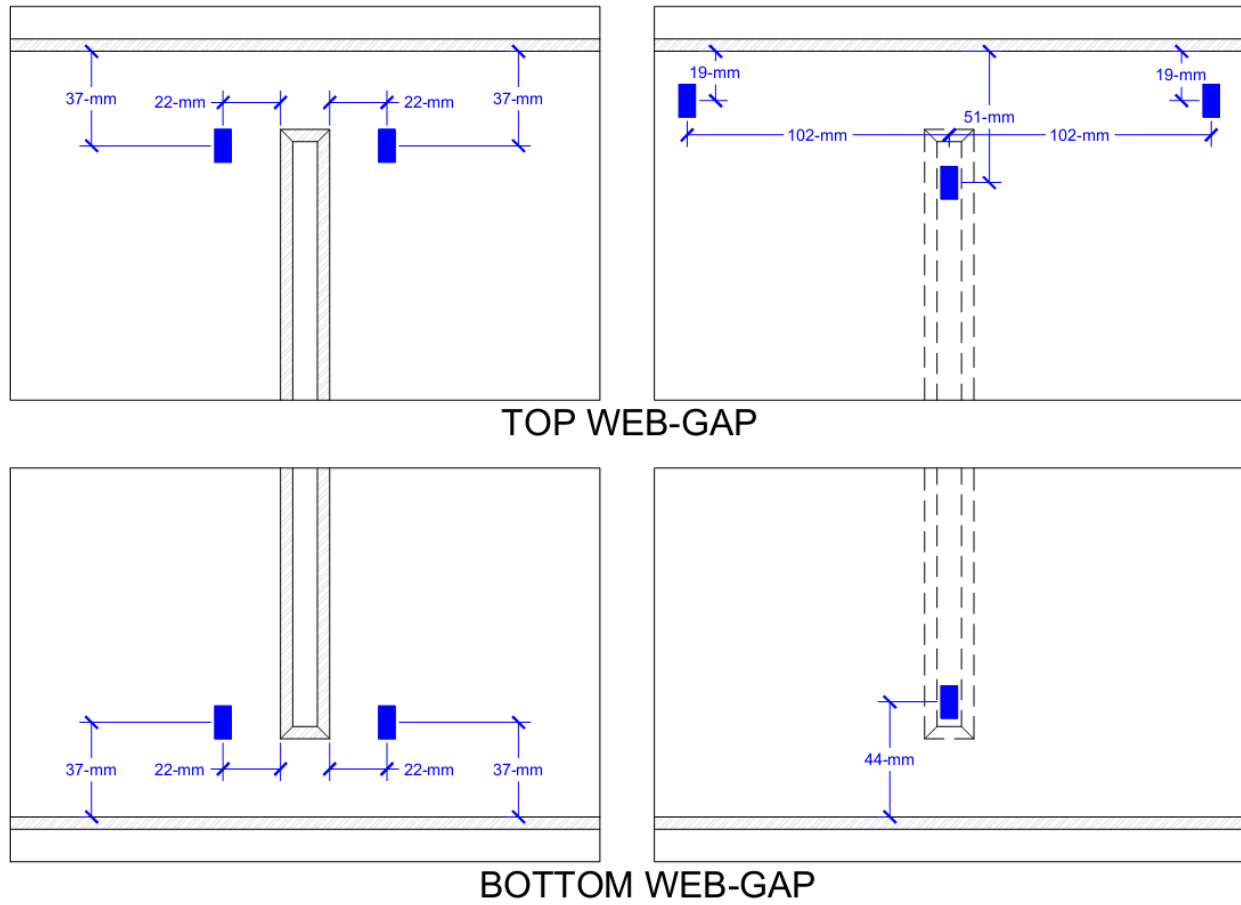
Strain gage placement near the top and bottom web-gaps on the 9.1-m (30-ft) test bridge for both exterior girders (north and south girders)
